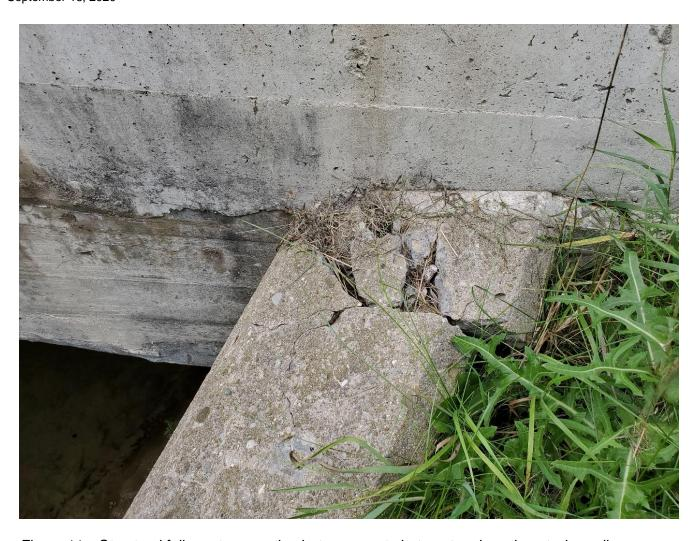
Structural failure at connection between east abutment and southeast wingwall
